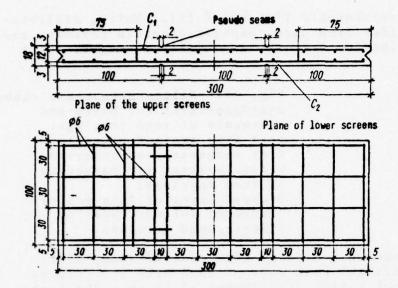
Reinforcing scheme of silicate-concrete slabs: C₁-upper screen;
